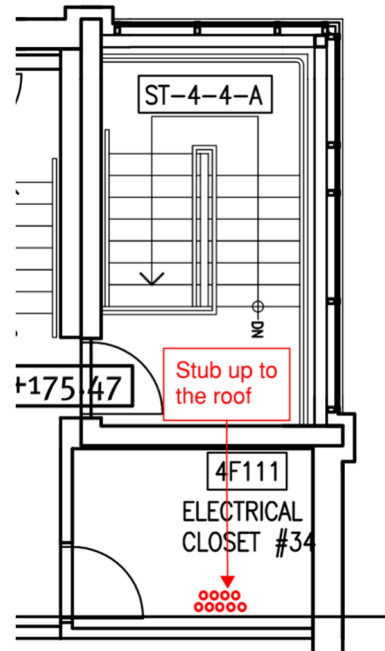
Proposed conduits stub up in Electrical Closet #34
